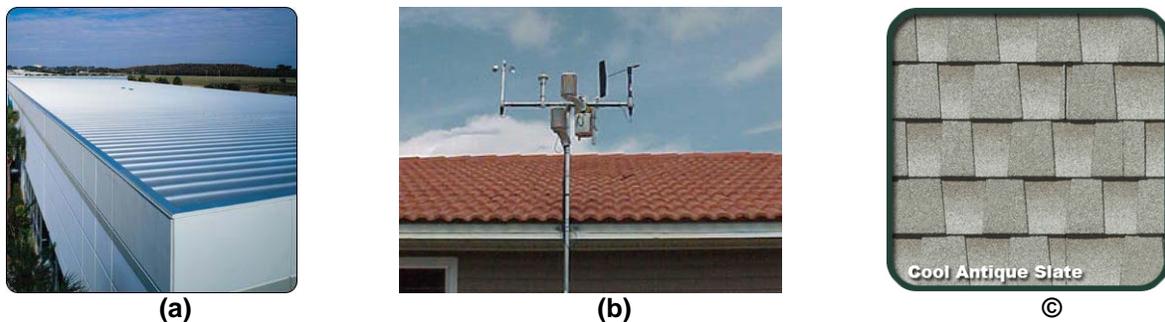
White metal roof (a), roof tile coatings (b), and architectural shingles (c) (<http://www.elkcorp.com>).
